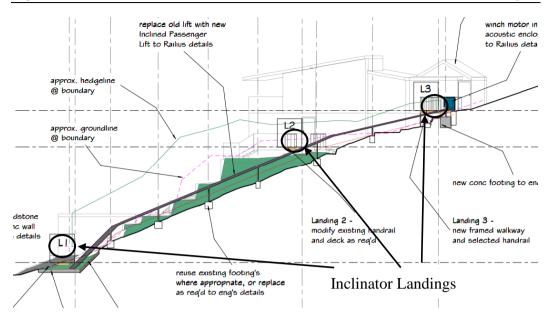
Elevation Plan showing location of the Proposed Inclined Passenger Lift. Source: Railius.
